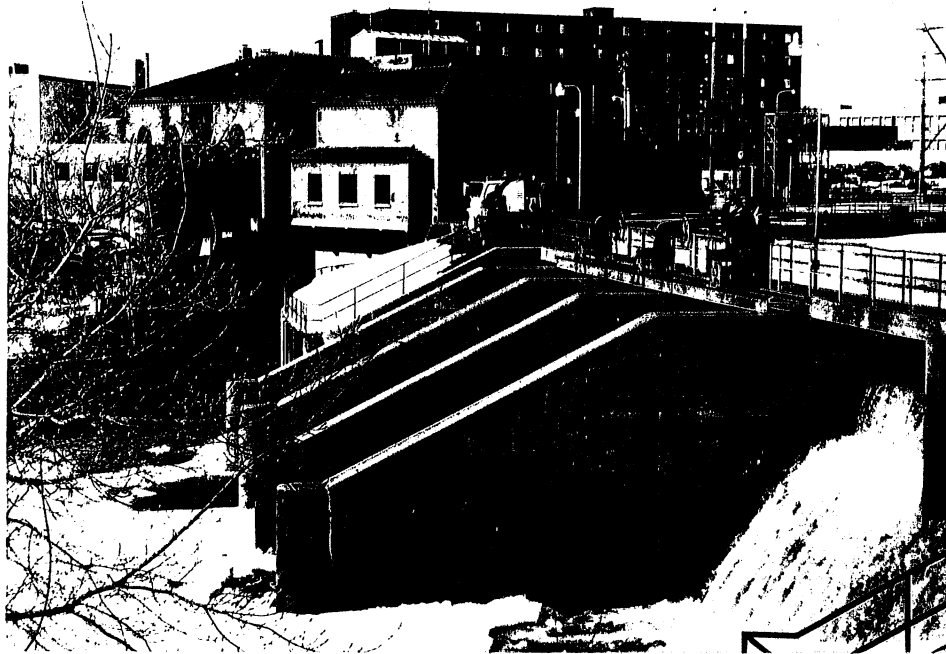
View from left bank of powerhouse and spillway. Note steam truck (used to thaw gates prior to spring runoff) parked on earth embankment, and switchyard located on the right.
